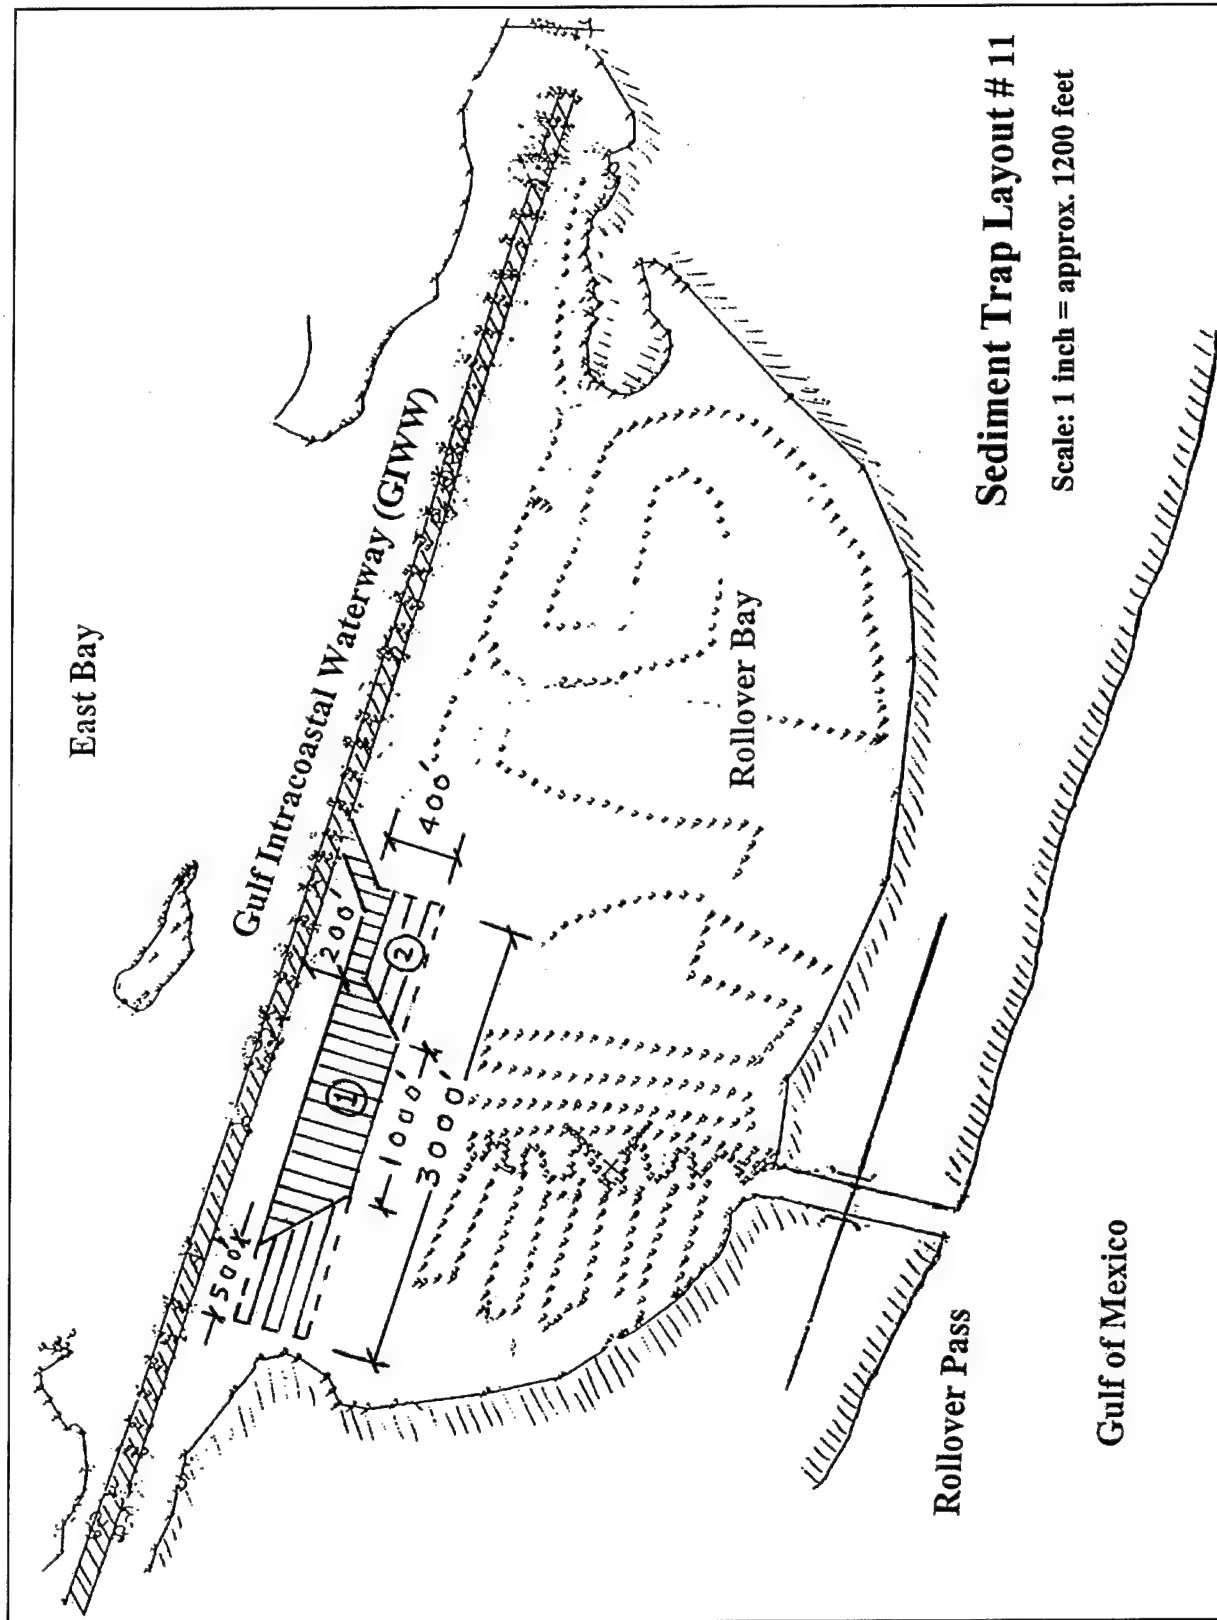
Construction phasing of sediment trap Layout 11 (Distance is in feet. To convert feet to meters, multiply by 0.3048)
